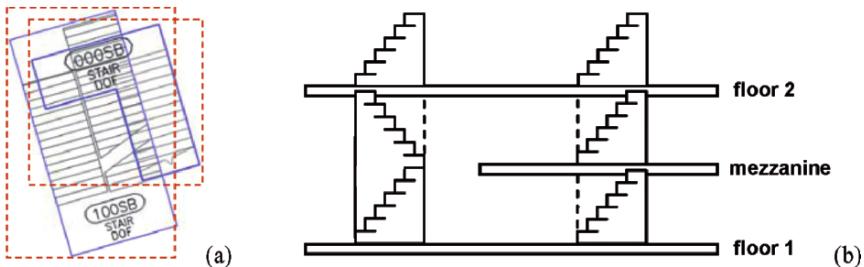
Vertical Portals. (a) plan view of stairs on adjacent floors. Axis-aligned bounding boxes (red) overlap; (b) mezzanines in the floor stacking sequence
